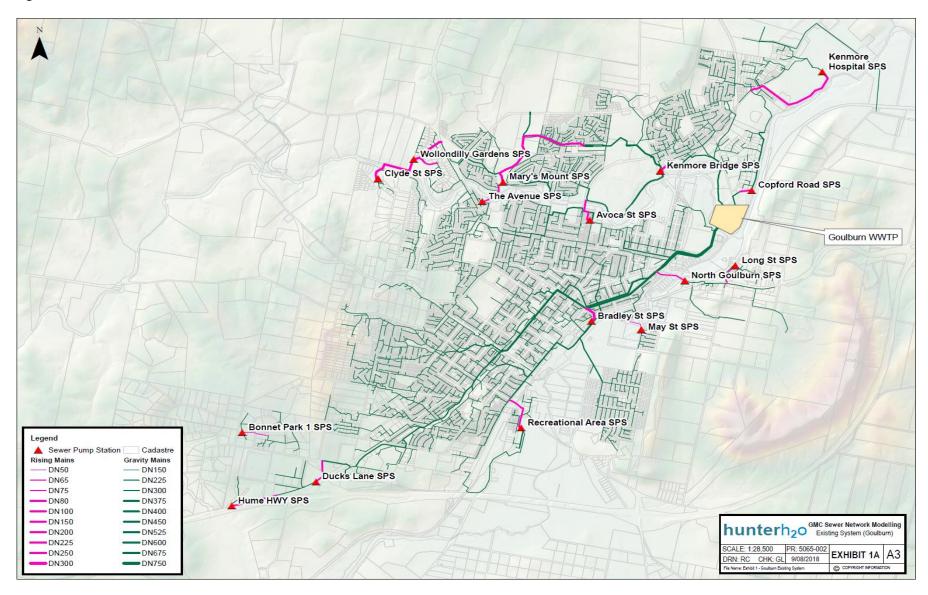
shows the location of the Wastewater Treatment Plant.
